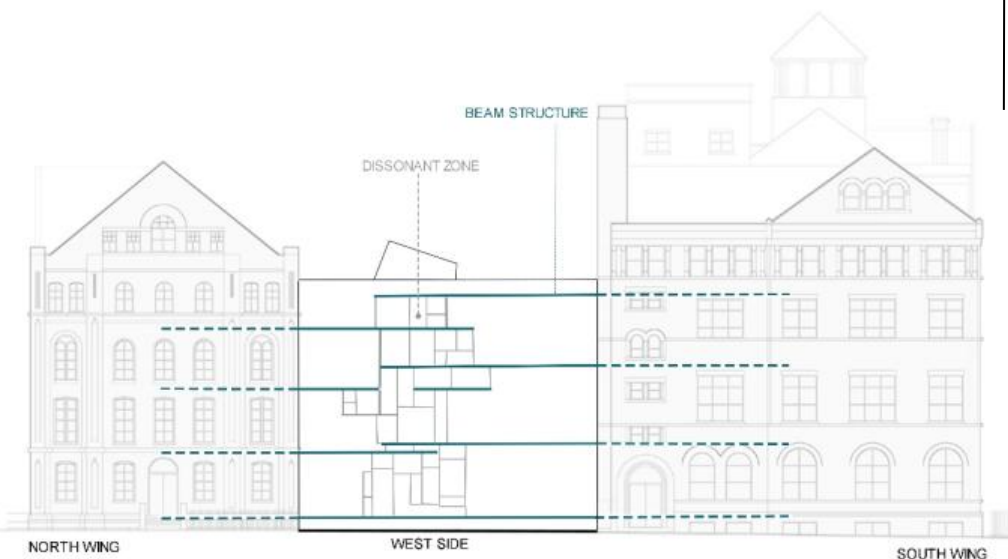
THE ASYMMETRY BETWEEN FLOOR LEVELS (RABIJ, 2021) ORIGINAL SOURCE (STEVEN HOLL ARCHITECTS, 2005)
